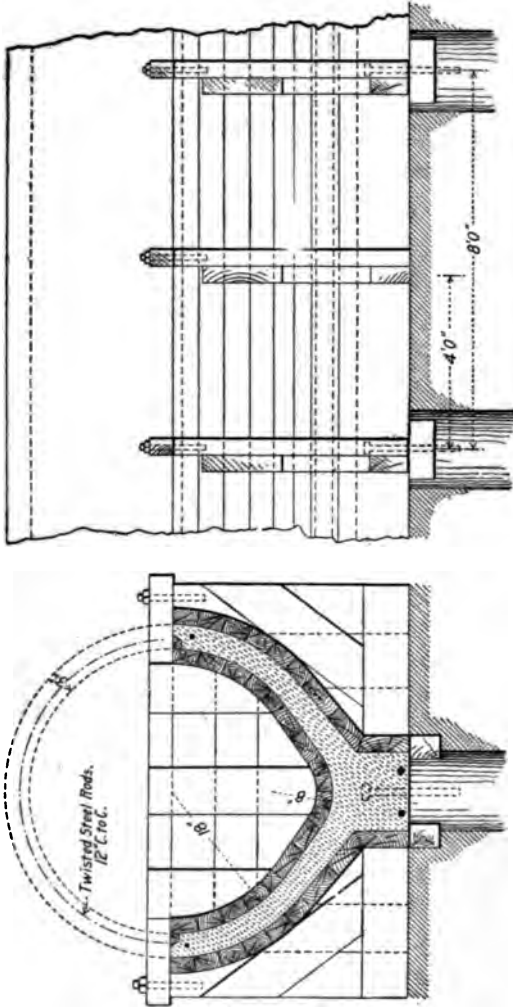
Gilbert Street Sewer, Cleveland, O.
